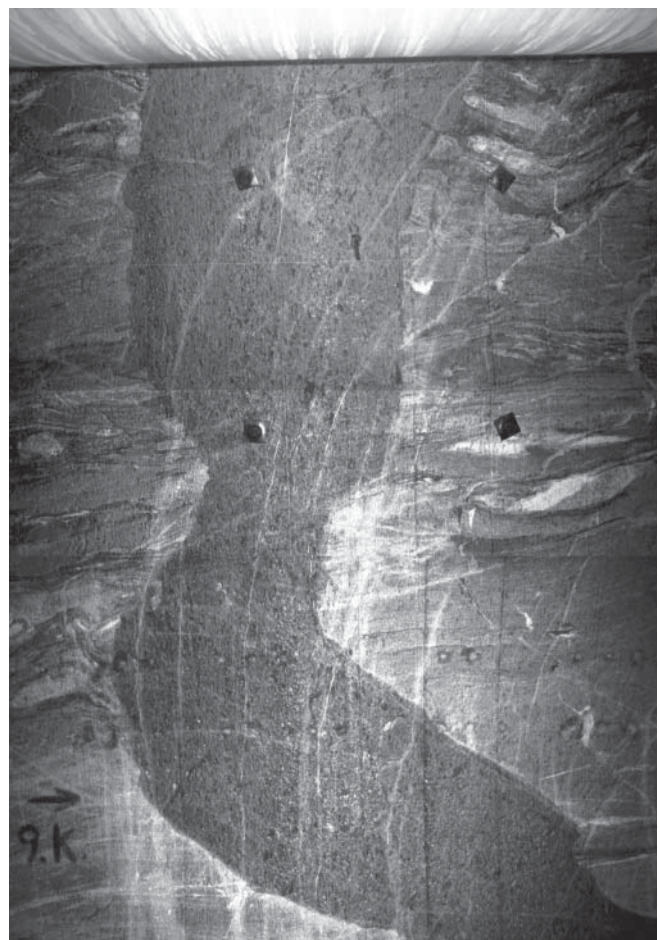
Photograph of tunnel wall showing a cross cutting dolerite dyke
